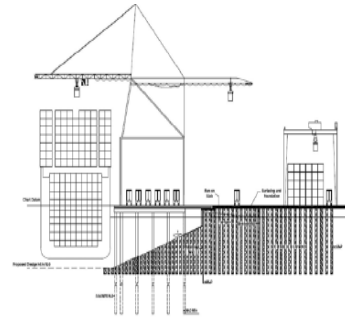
Cross-Section showing Stone Columns along Quay & Associated Yard.
